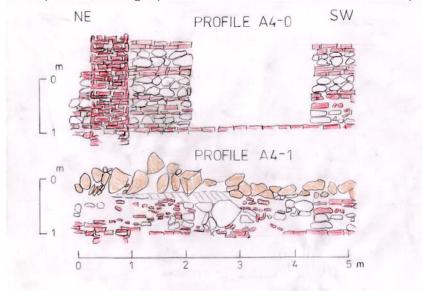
Present profile A4-1. Damaged rest of wall of B.CH. built of stone and plate bricks with space filled up with gray mud and rubbish. Above one can see brown river pebbles used for construction of E.M.CH. Between wall of E.M.CH and present below remains of B.CH. one can see plaster made of clay and calcite (marked) used for preparation of surface under the wall of E.M.CH.
